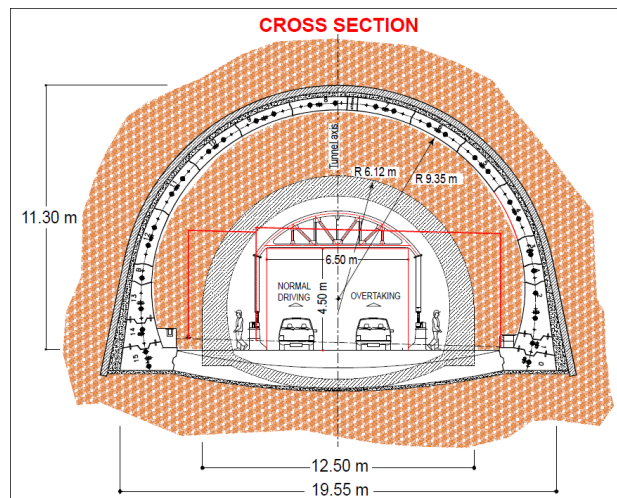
Nazzano Tunnel: tunnel section type for widening in the presence of traffic
